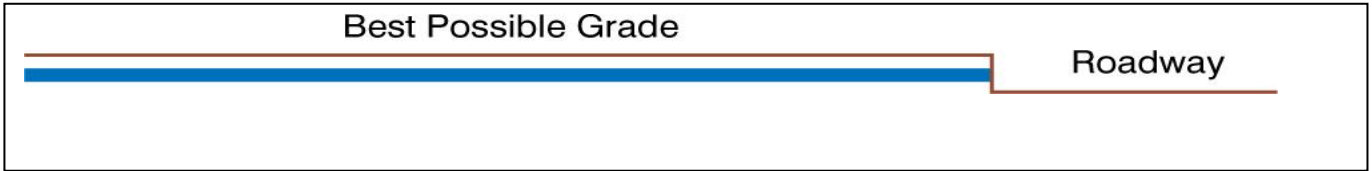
STORMWATER DRAIN LAID AT GRADE TO BARREL DRAIN
